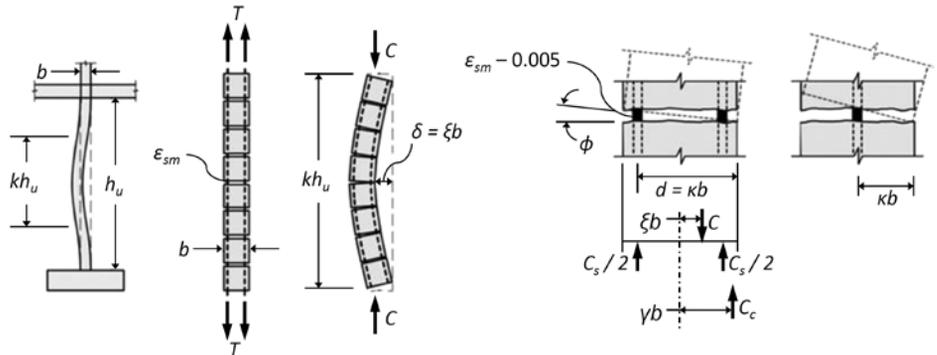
Lateral instability of wall boundary previously yielded in tension [NIST, 2014].
